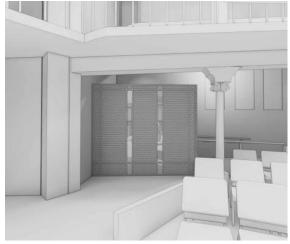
Proposed Internal Elevation of the Auditorium stage. Source: Trethowan Architecture, 2024.
